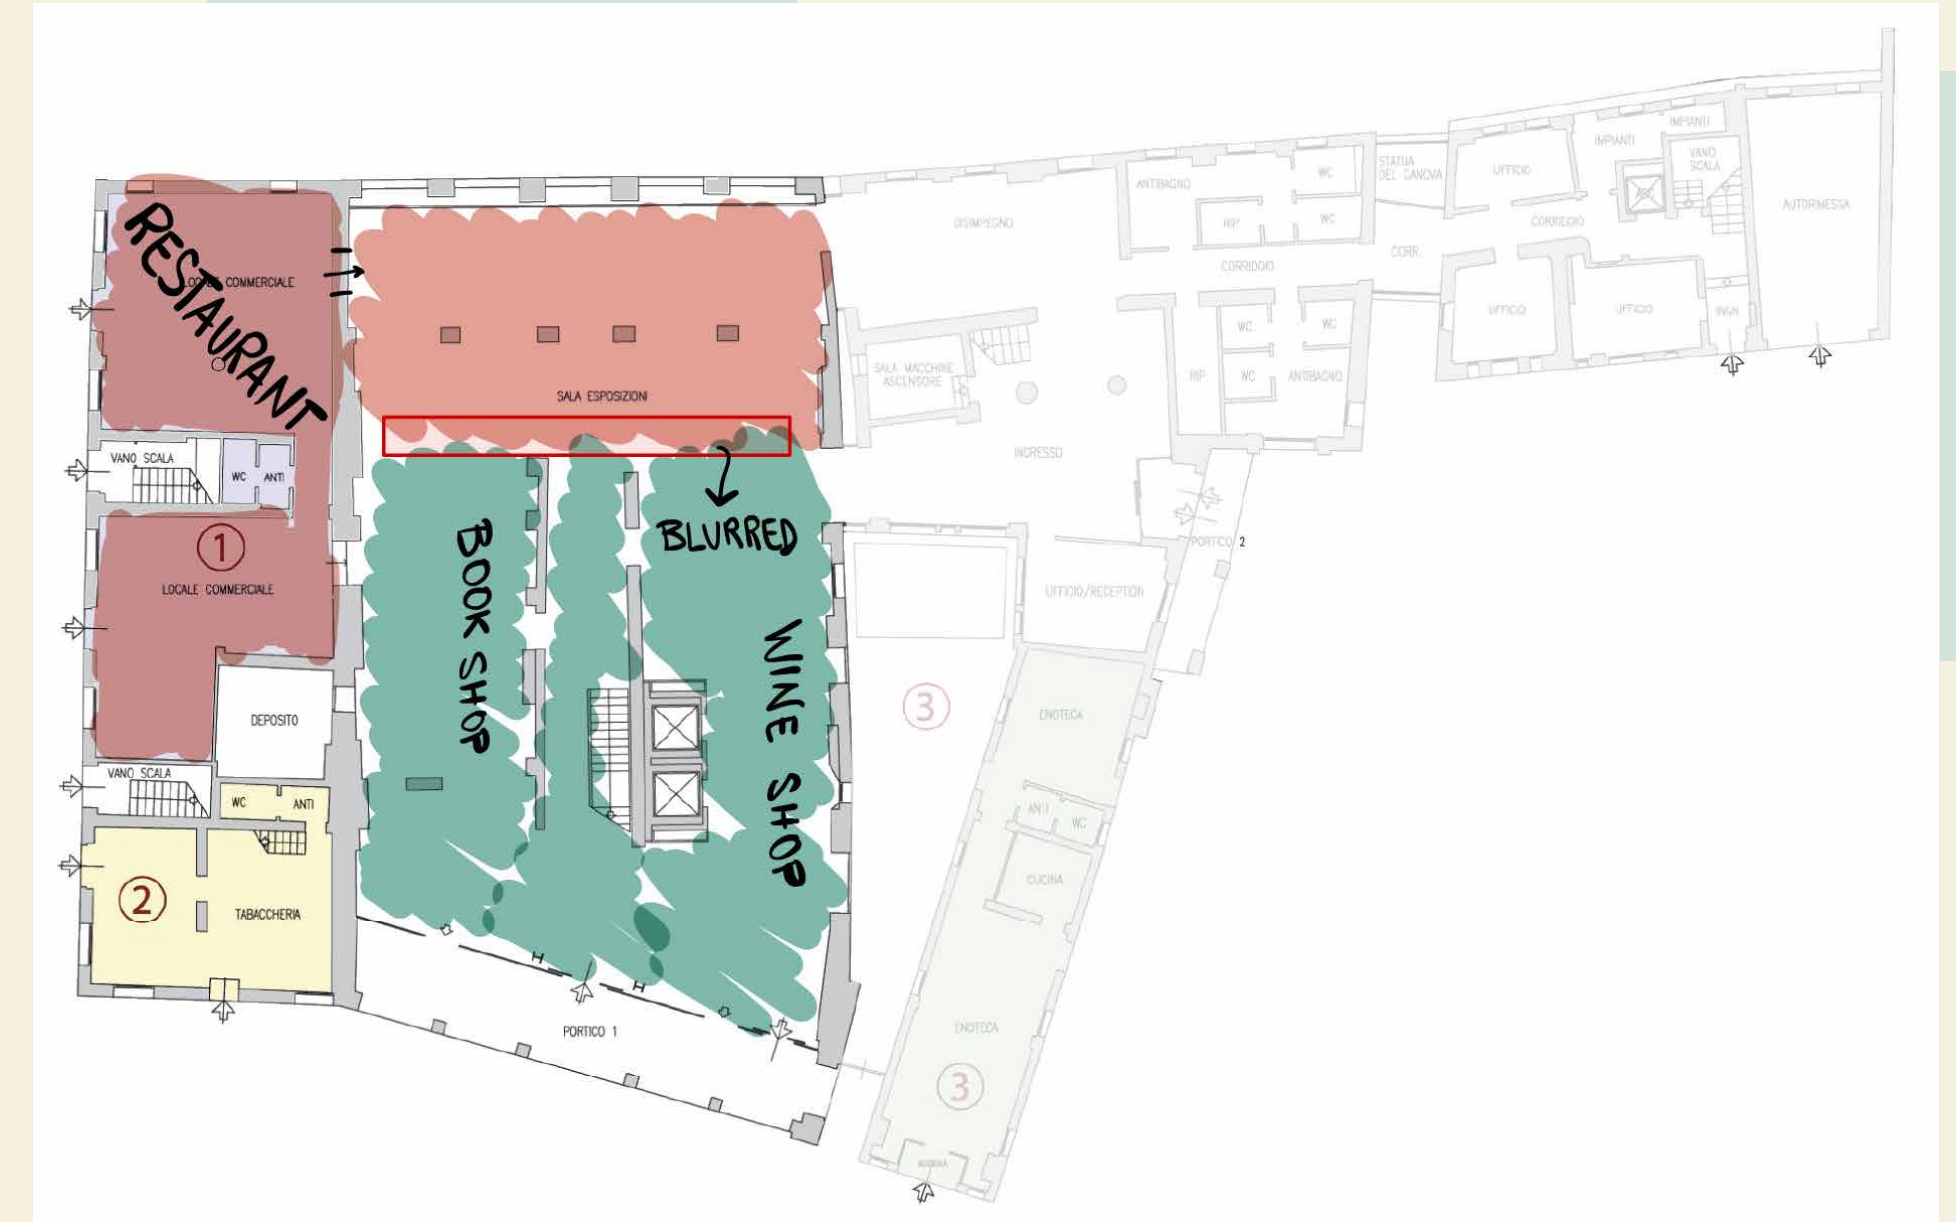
Ground floor Casa dei Carraresi, sketches by the author. (Fondazione Cassamarca, 2014).
